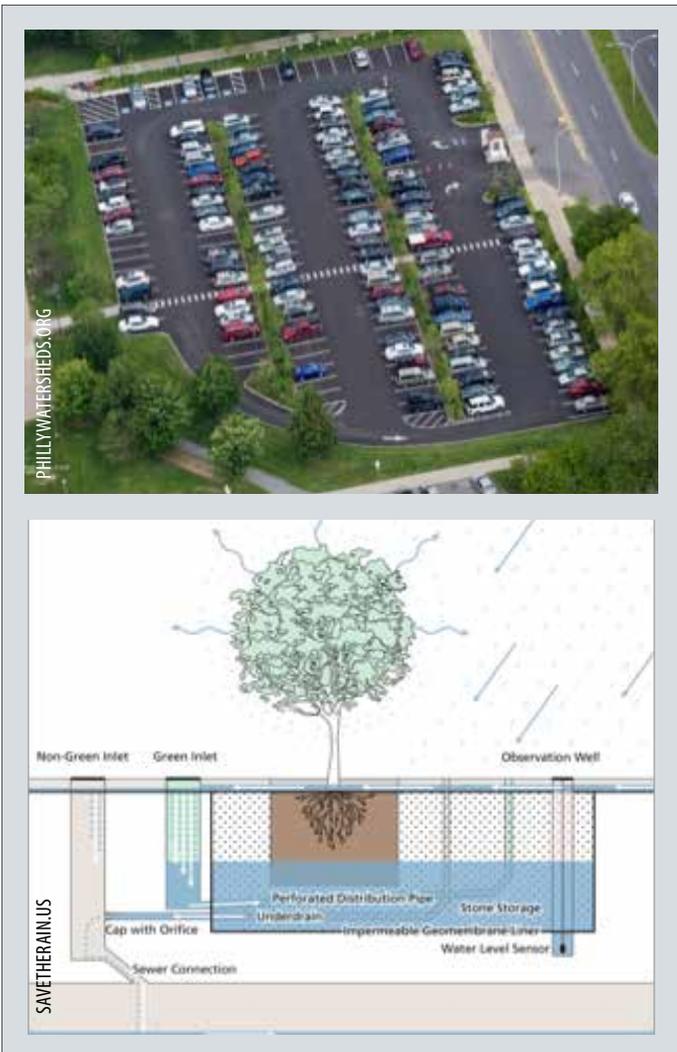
Aerial view and cross section of “tree infiltration trenches”, which are often used to drain and cool parking lots while improving runoff water quality and enhancing aesthetics.
